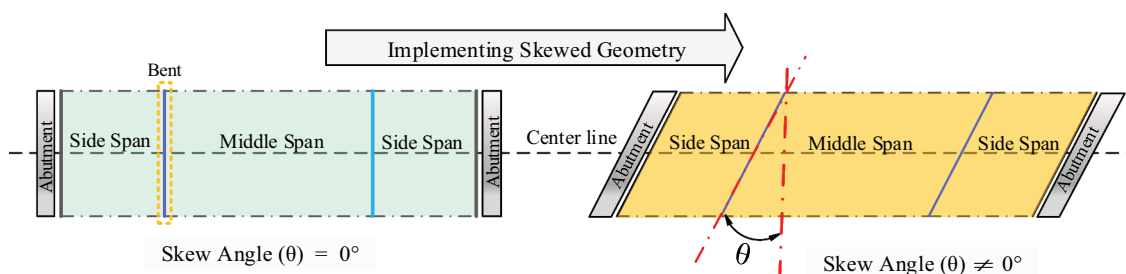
Geometric configuration of the straight/skewed concrete I-girder bridge system.
